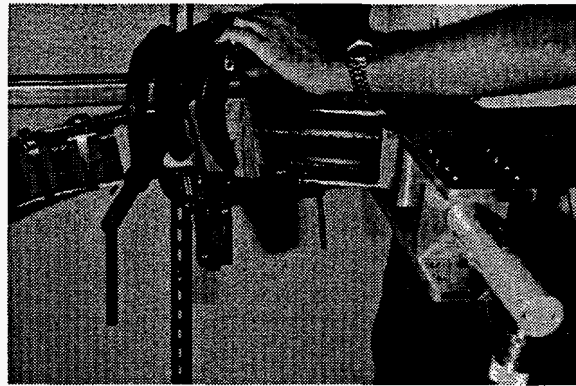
Installation of 750 MCM cables with c-clamps and the portable hydraulic press.
